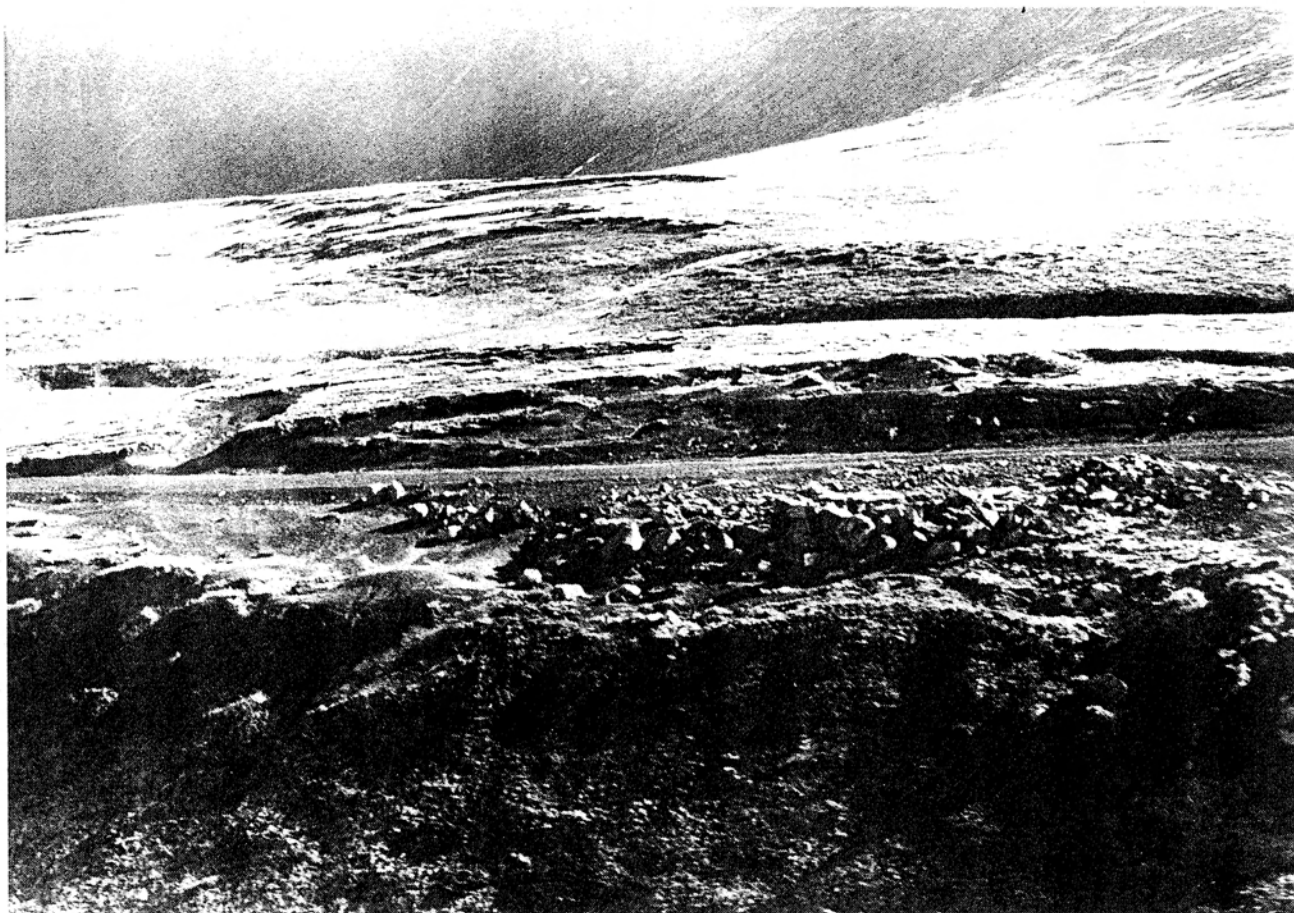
A segment of the existing road in Driftwood Valley. Most of this road requires only culvert and grade repair to be operational.
